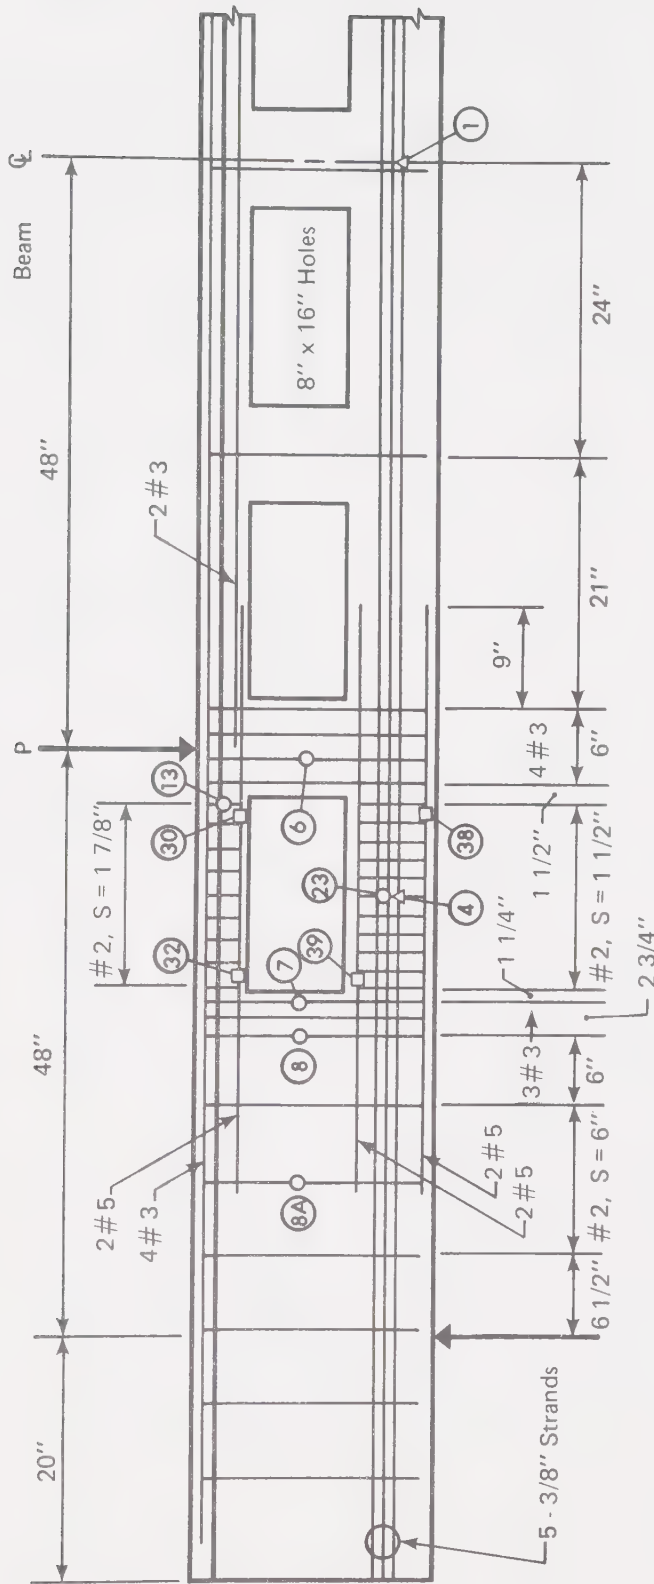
Reinforcement Details and Strain Gage Locations for Beam 23-16-4
